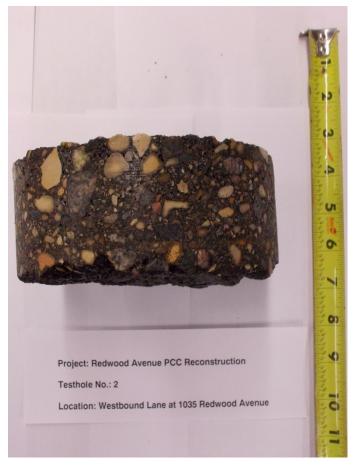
TH02: Westbound lane at 1035 Redwood Avenue, 1.0 m from curb
